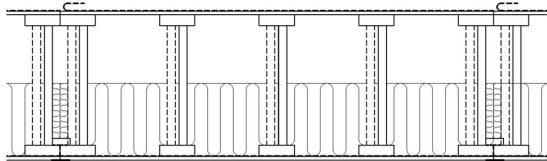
Cross section of 2.4 m wide roof element of G-roof. The element includes five G-trusses.
